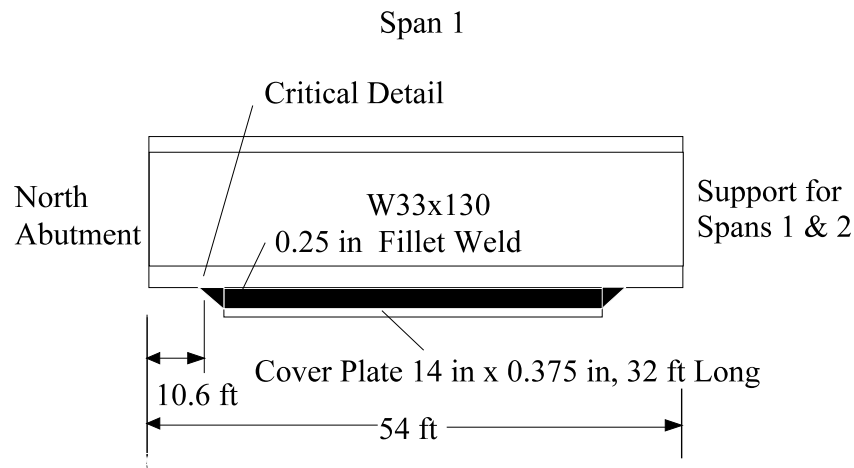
Welded Cover Plate Girder, Detail No. 1
